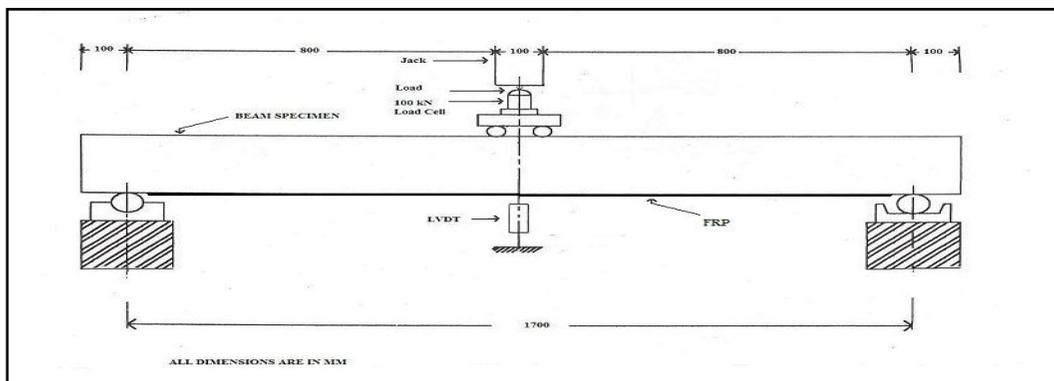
LOADING ARRANGEMENT FOR BEAM SPECIMENS
